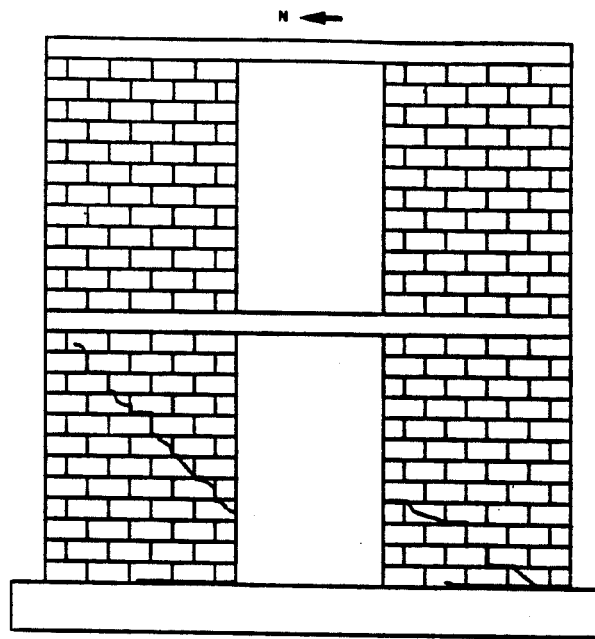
Sp. 2b: Cracking Due to Pretest Loading
